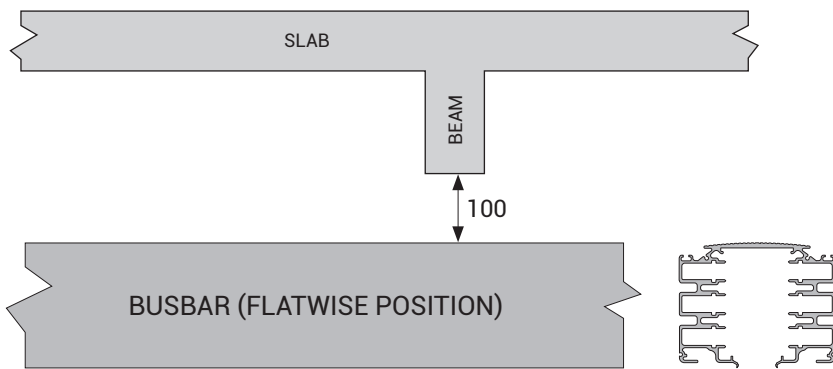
CROSSING UNDER A BEAM HORIZONTAL POSITION
